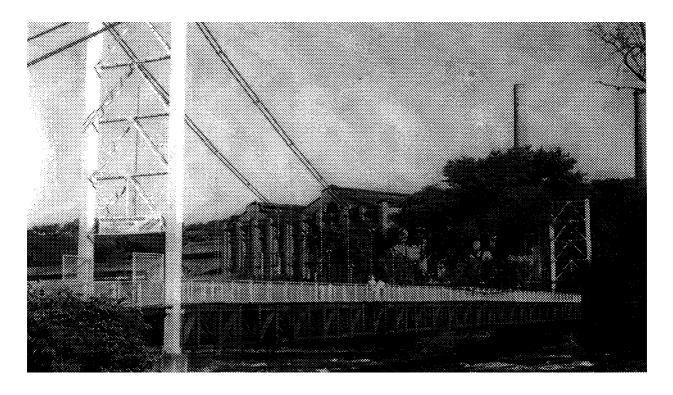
Suspension pedestrian bridge over Piracicaba river. This bridge is 105 meters long, 78 meters span, consists of two longitudinal parallel truss beams of Eucalyptus specie and was designed by LaMEM in 1992.
